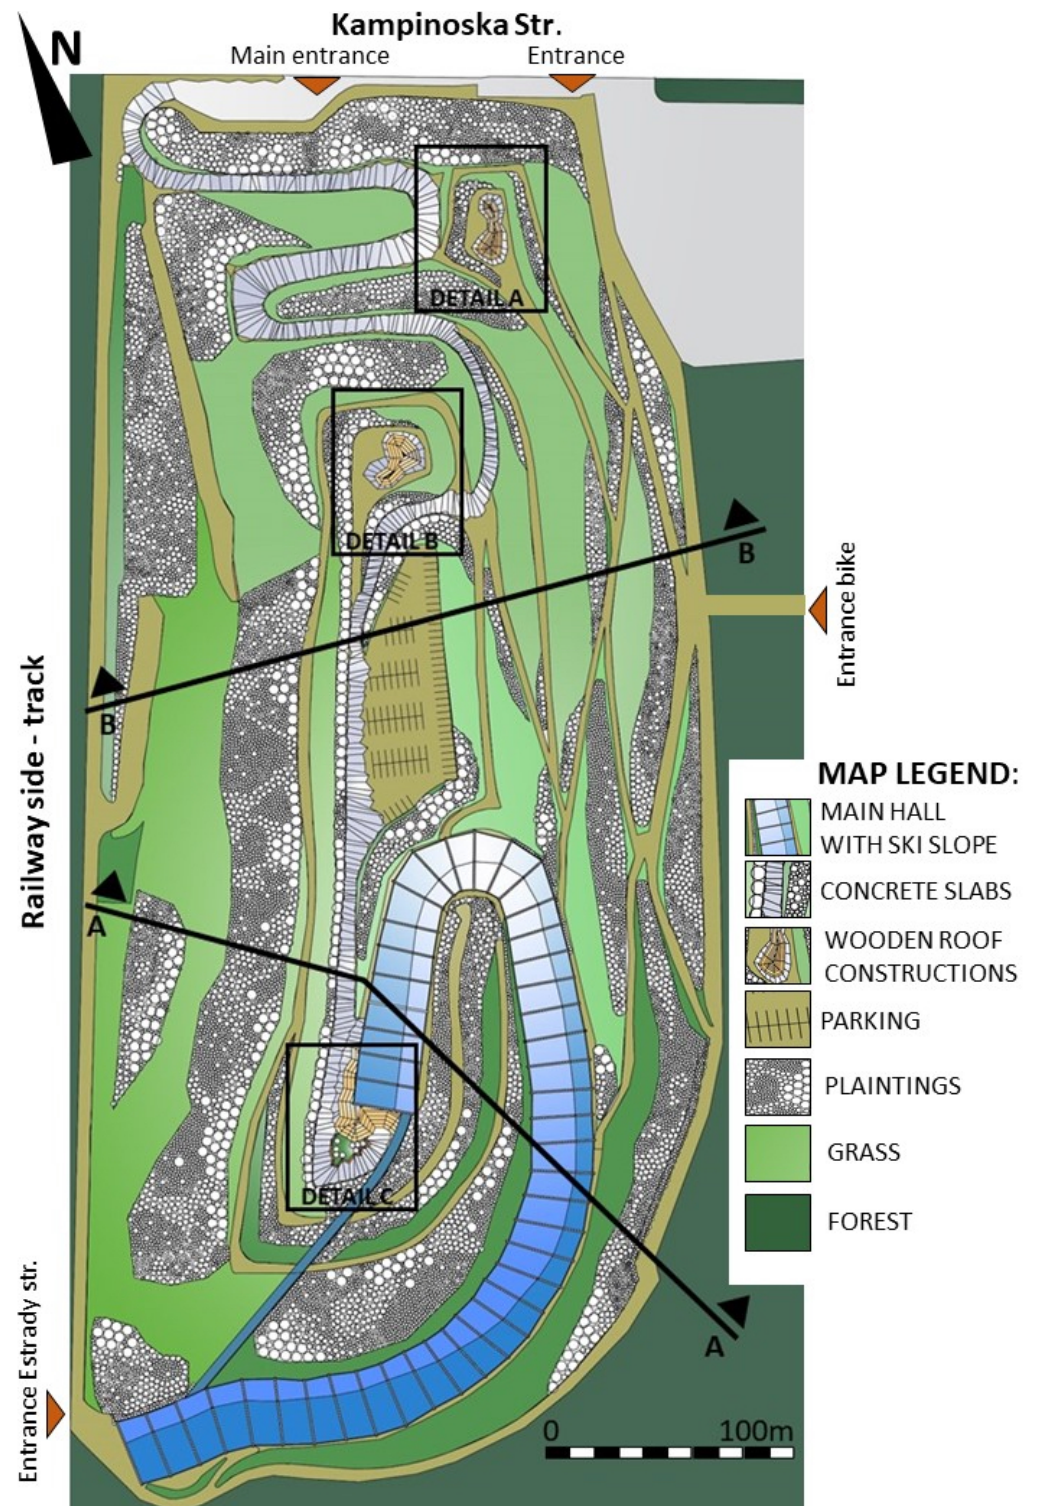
The concept of the landfill development plan with details presented in Figure 4 and cross-sections showing the slope geometry with reinforcement elements in Figure 5.
